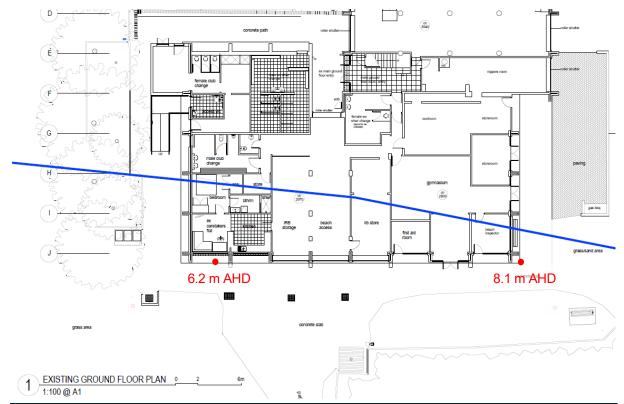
SLSC Existing ground floor: maximum vertical elevation for piled foundations to assume soil capacity based on ZRFC (see Figure 4).
